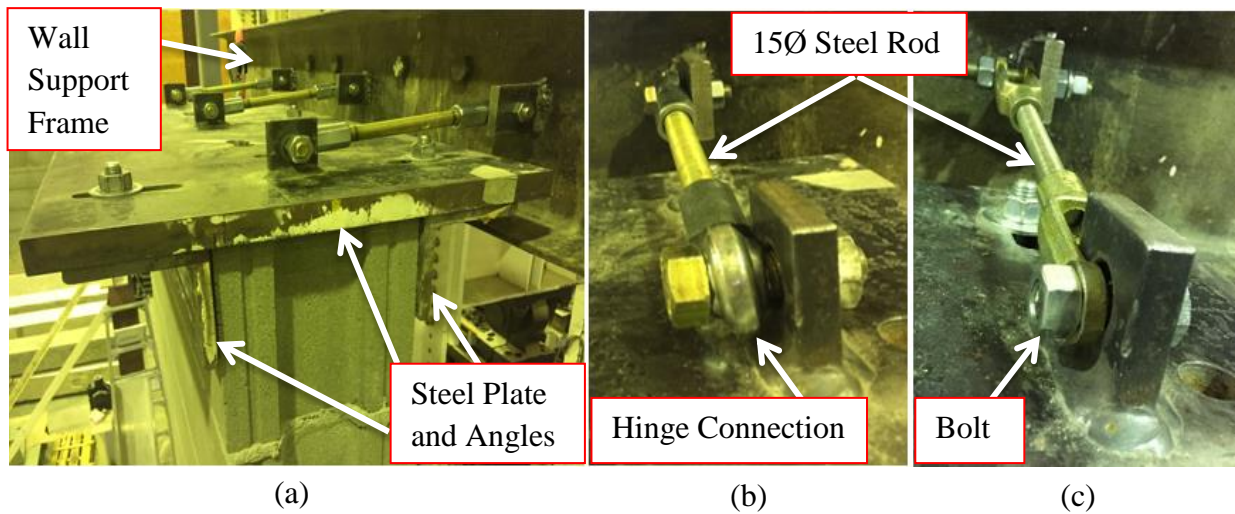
Top Support Connection to Steel Rods: (a) Overall Setup of Rods, (b) Steel Rod Pinned to Plate, and (c) Steel Rod Bolted to the Plate
